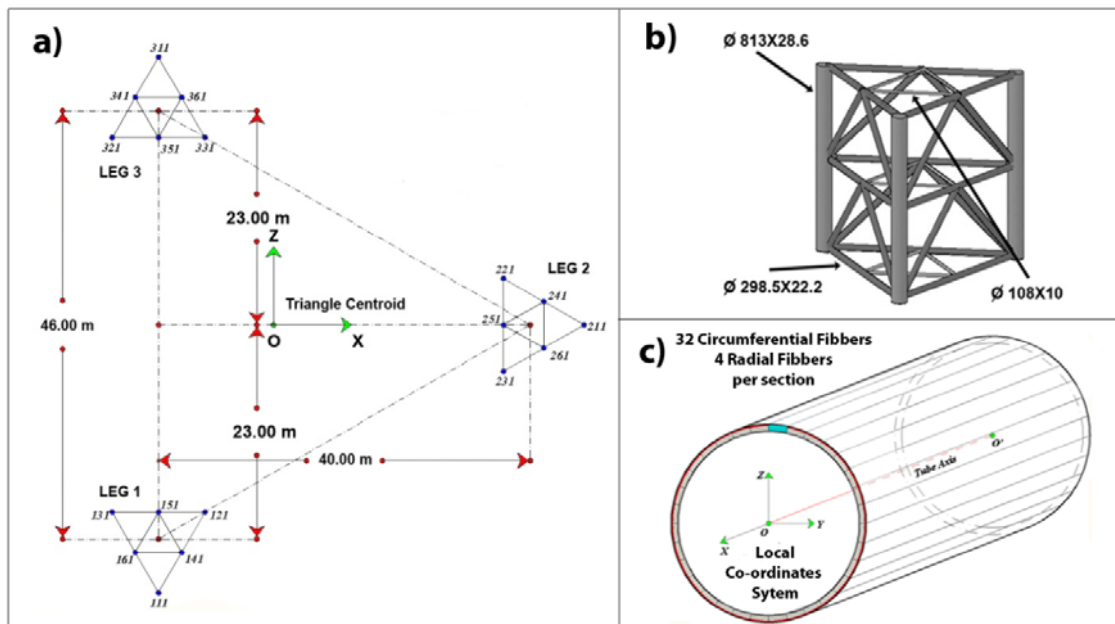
(a) Plan view geometry, (b) members of truss legs, (c) FE modelling of members.
